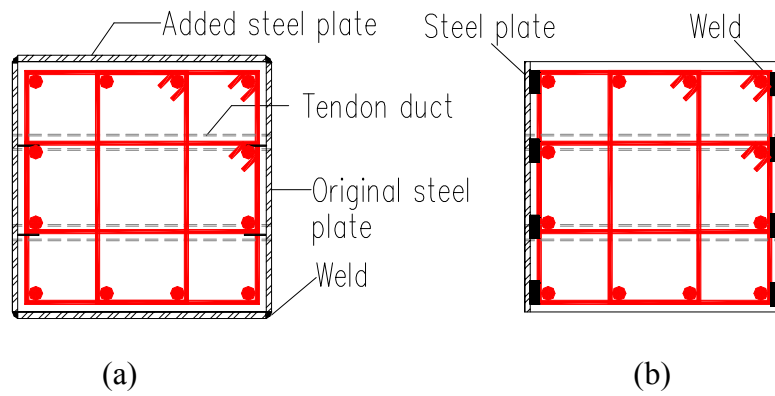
Anchorage of the embedded steel plate in column (cross section view)
